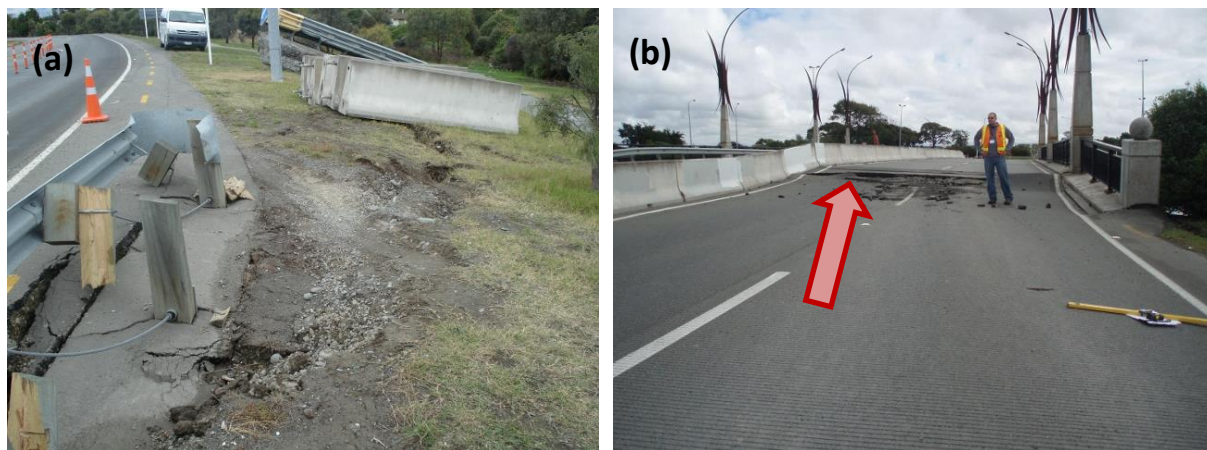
(a) lateral cracking/slumping of southern approach, ANZAC Bridge, (b) steepening and pavement compression of southern approach, ANZAC Bridge
